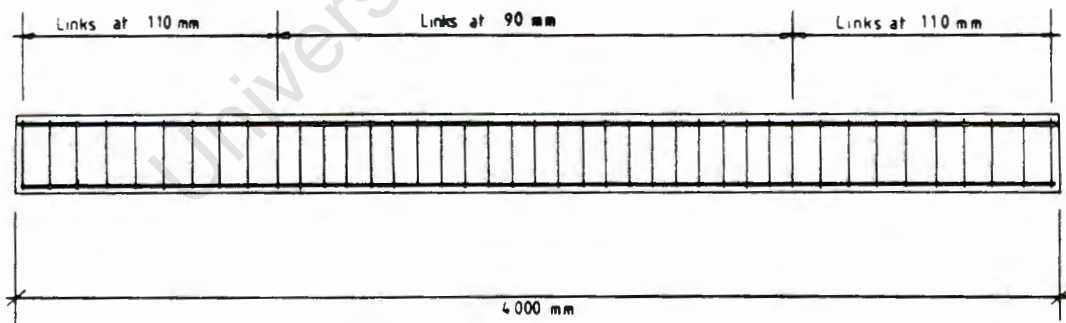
Stirrup spacing for the Two-Span Beams.
